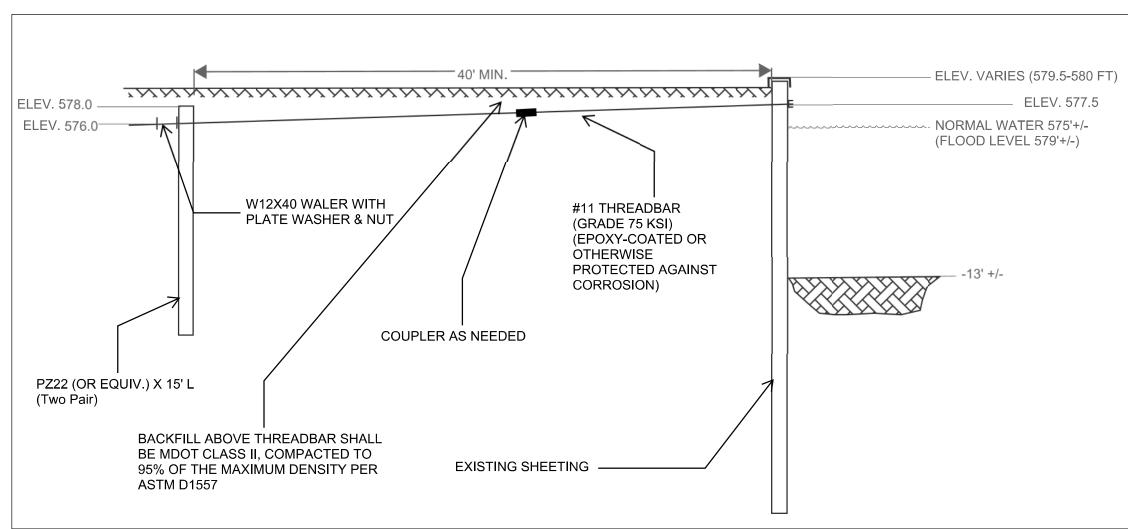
CROSS SECTION - SEAWALL REPAIR
